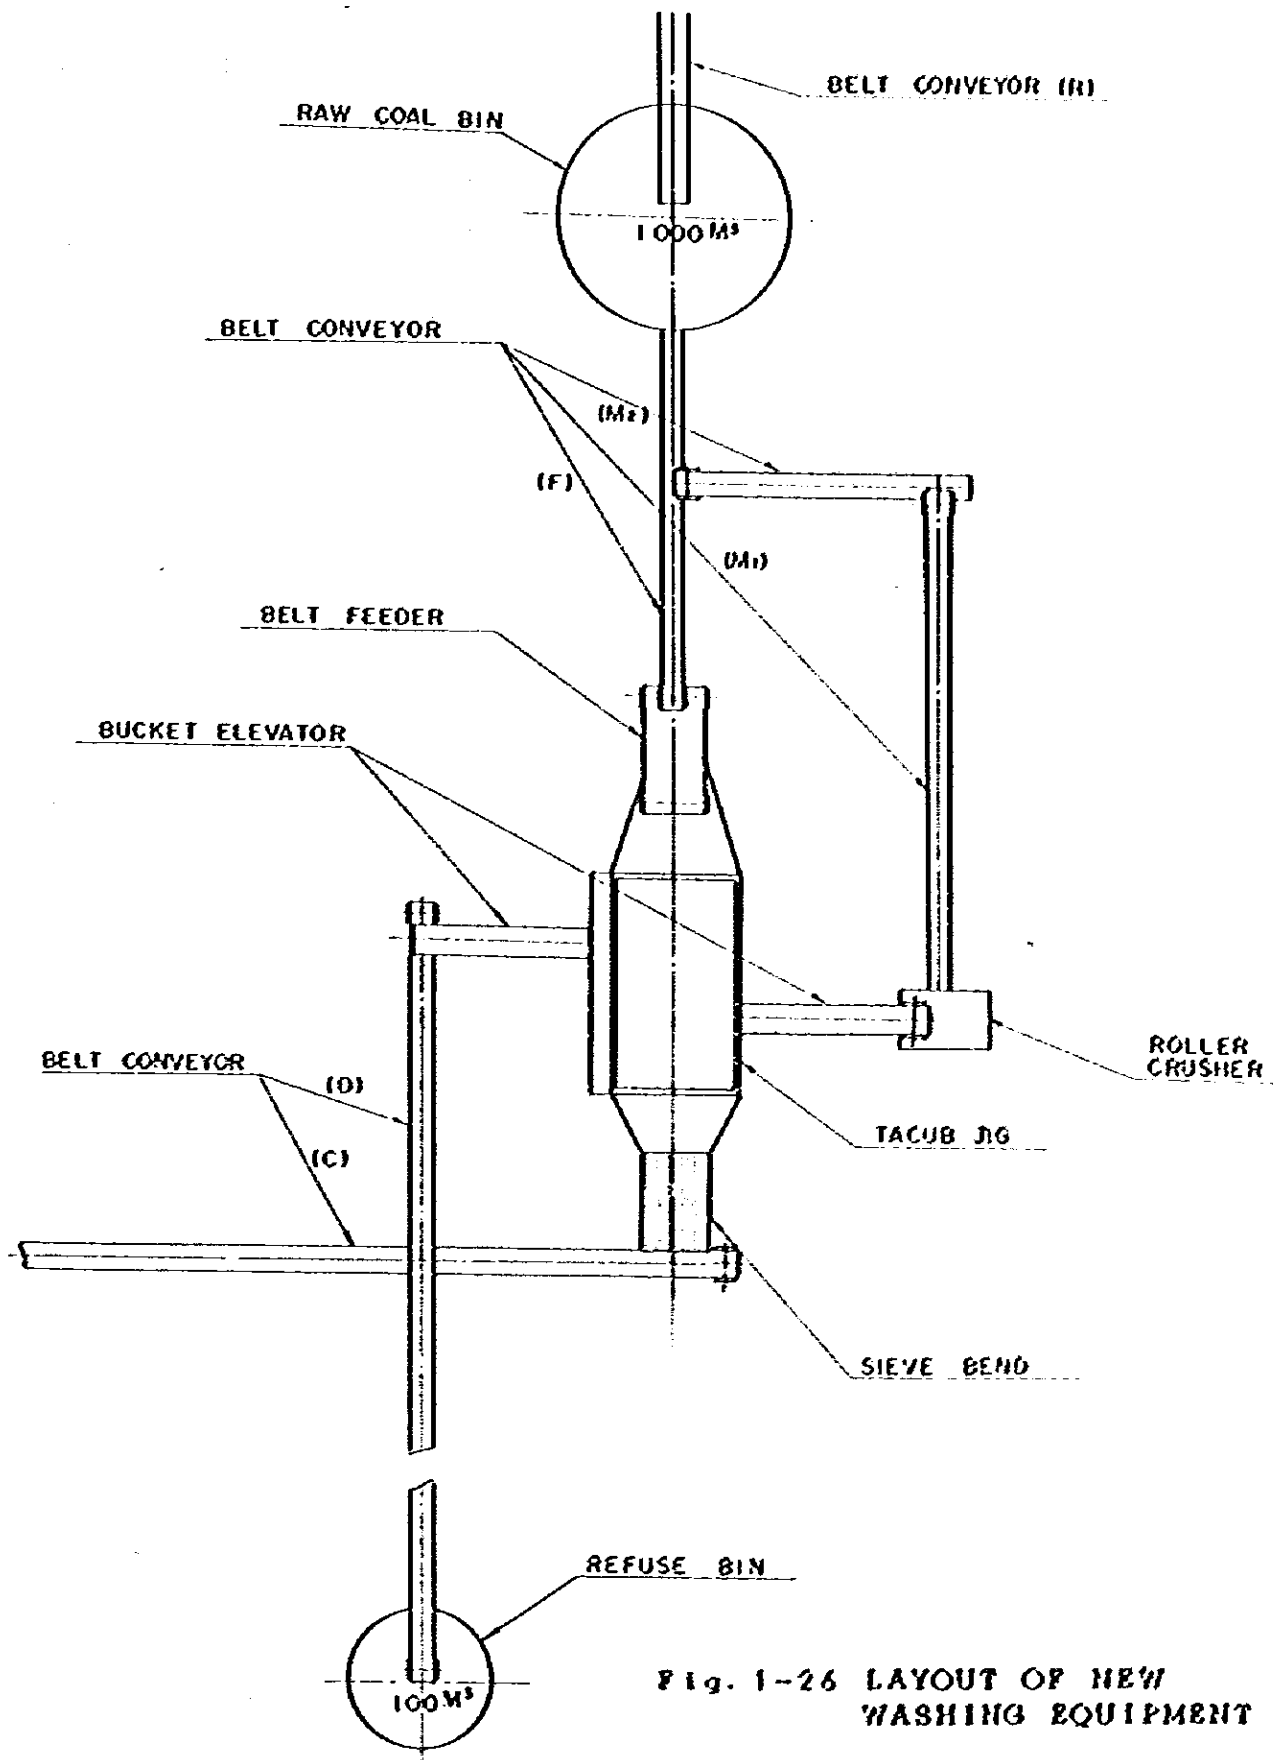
LAYOUT OF NEW WASHING EQUIPMENT
